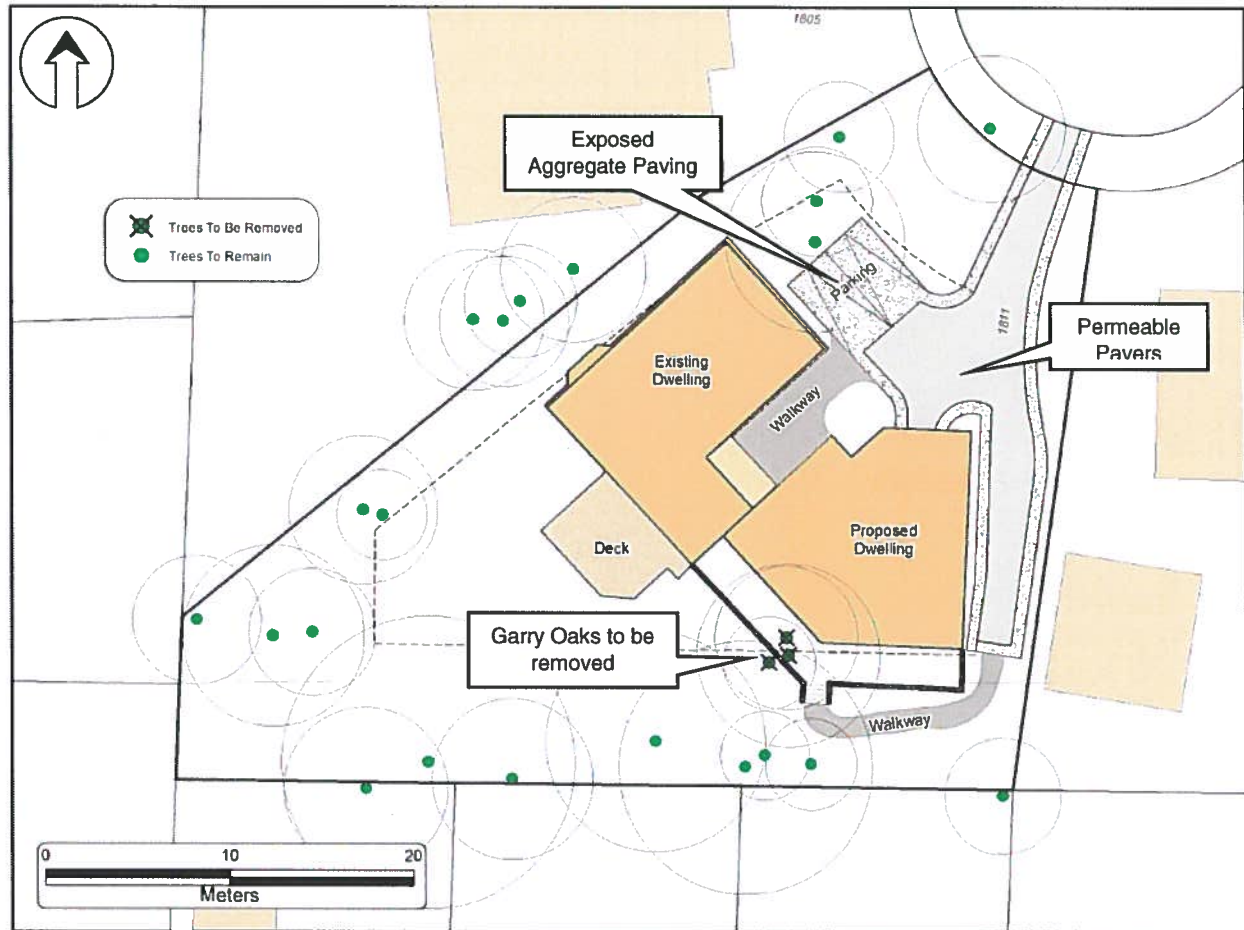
Proposed Site Plan (from plans by T-Square Design & Consulting)
